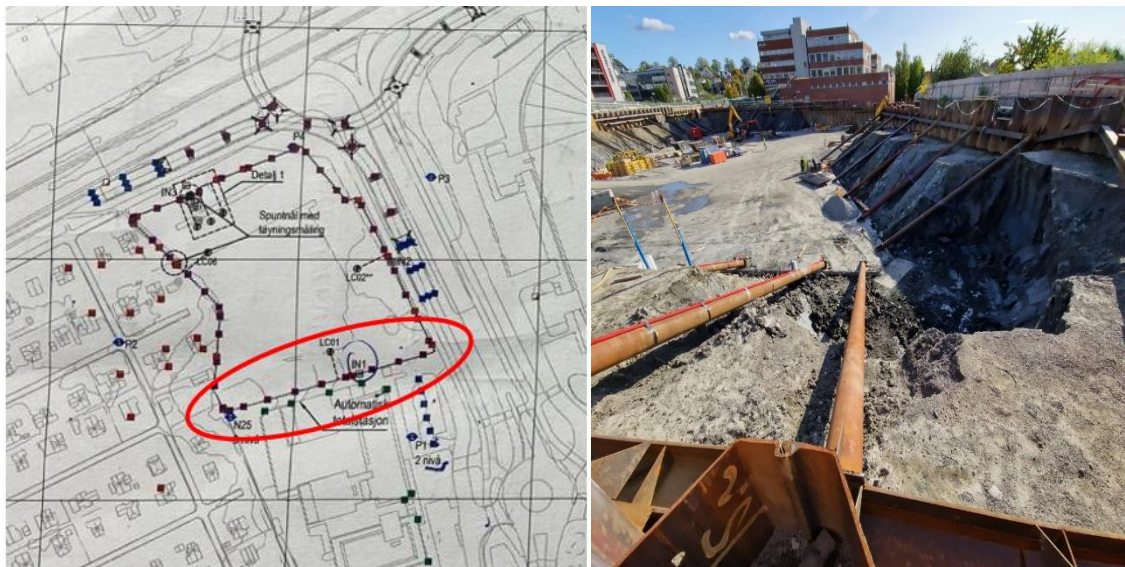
plan monitoring focus on the south part of the building pit (left) picture building pit (right). In this picture they have started excavating the corner section of the berm and we can also see the building being studied in the front
